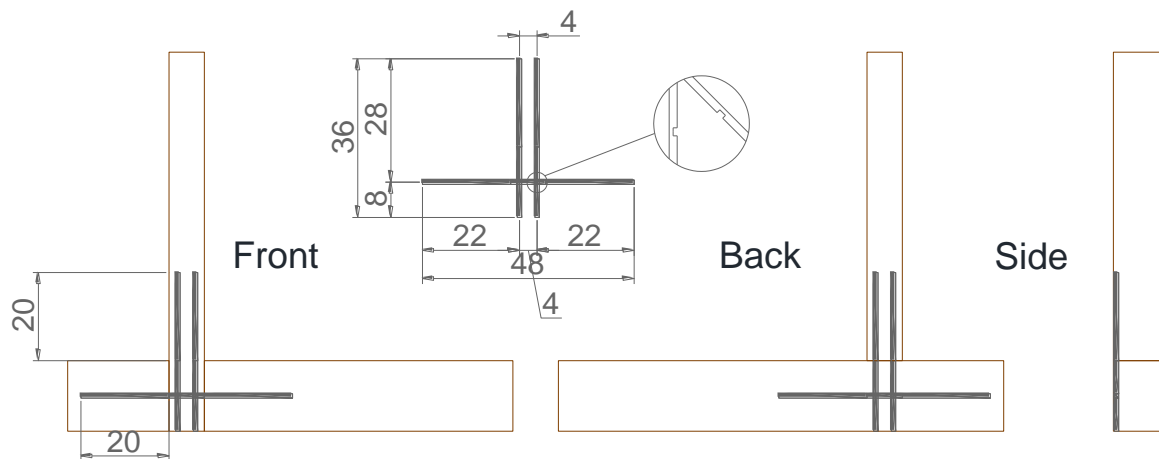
Section configurations of the NSM of steel rods regarding front, back and side point of view and configuration of the welded rods. (Dimensions in cm).
